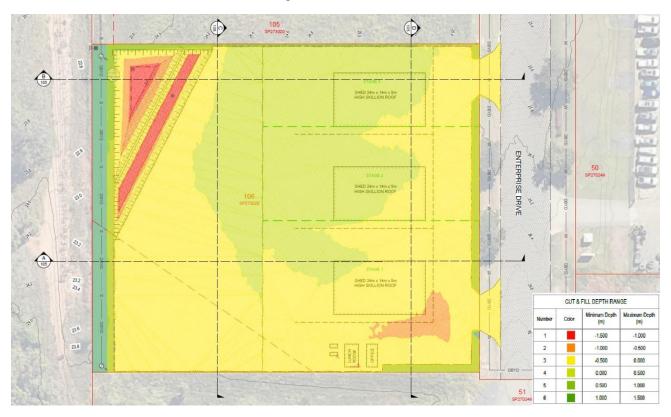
Bulk Earthworks Areas over the development site and Cut & Fill Elevation Range.
